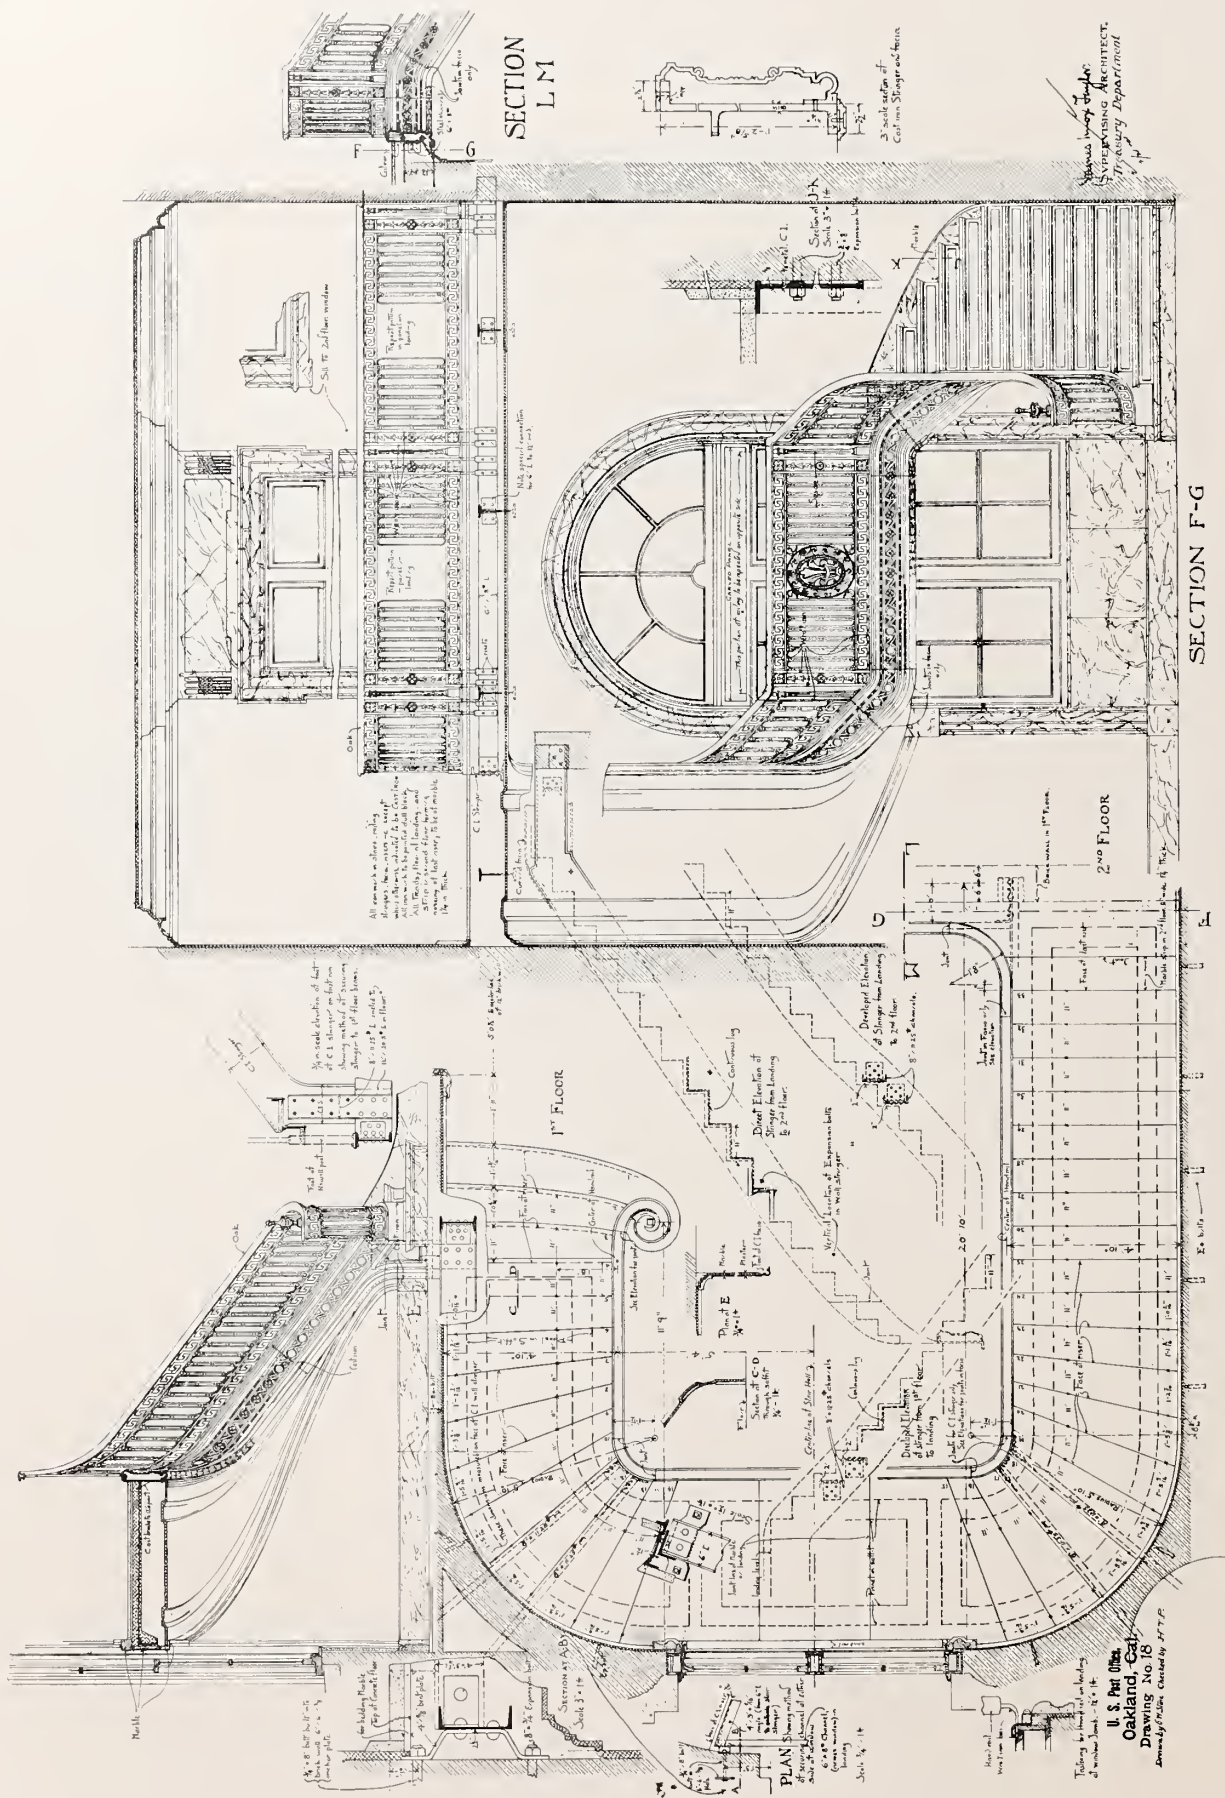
DETAIL DRAWING: POST OFFICE BUILDING, OAKLAND, CAL.
